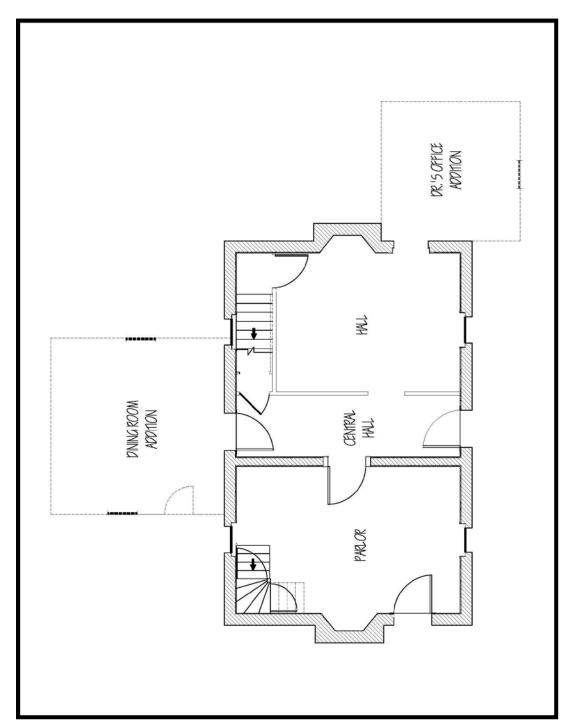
Hawthorn Hill, 1850 floor plan, Sumner County, TN. (Jessi White)
